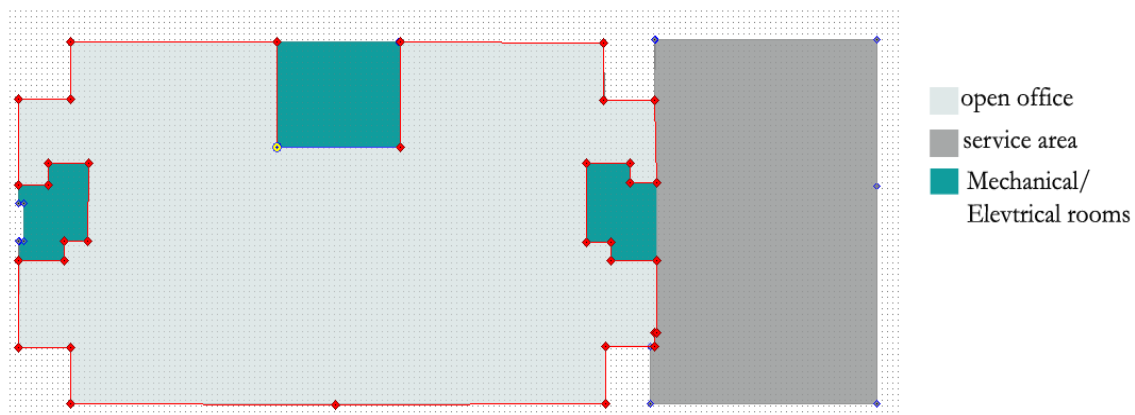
Zoning of Spaces in a typical office floor in ASCENDAS building.
